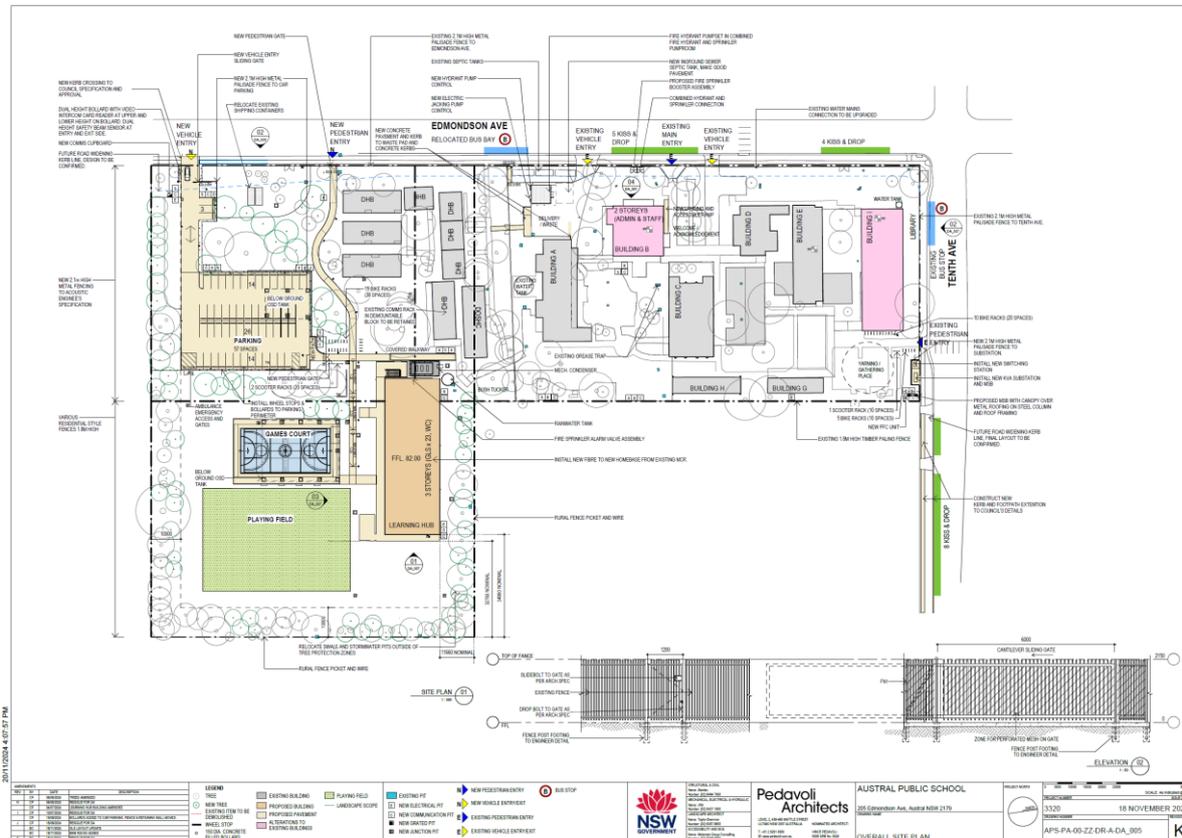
Proposed Site Plan (Source: Pedavoli Architects, Overall Site Plan (Rev K))
